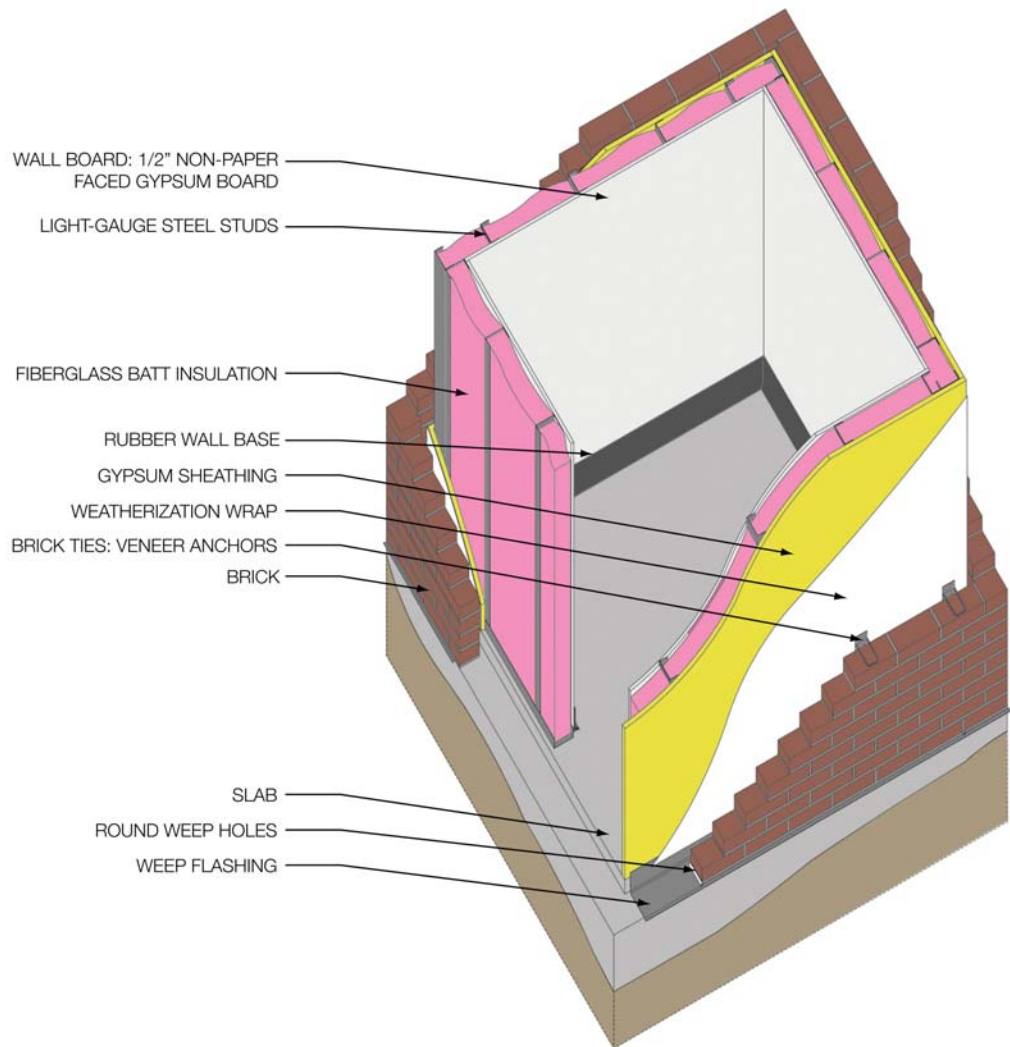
DIAGRAM: test pod E: metal stud.
